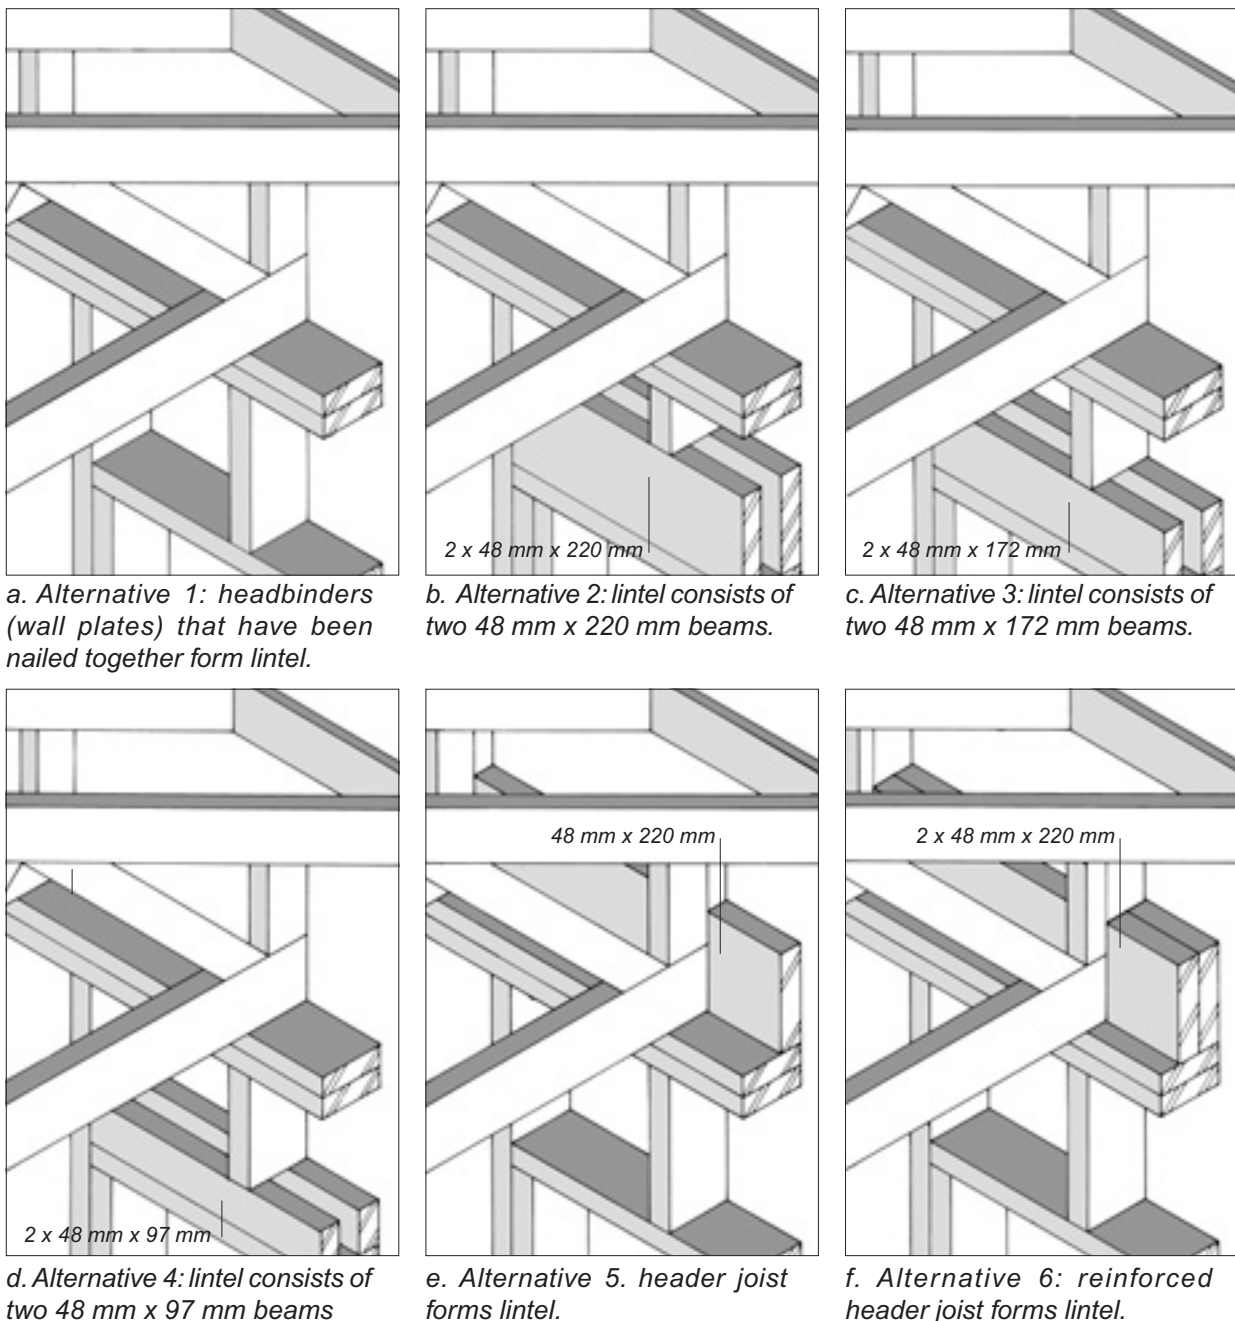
a – f. Maximum widths of window and door openings under roof structure (rough opening dimension).
